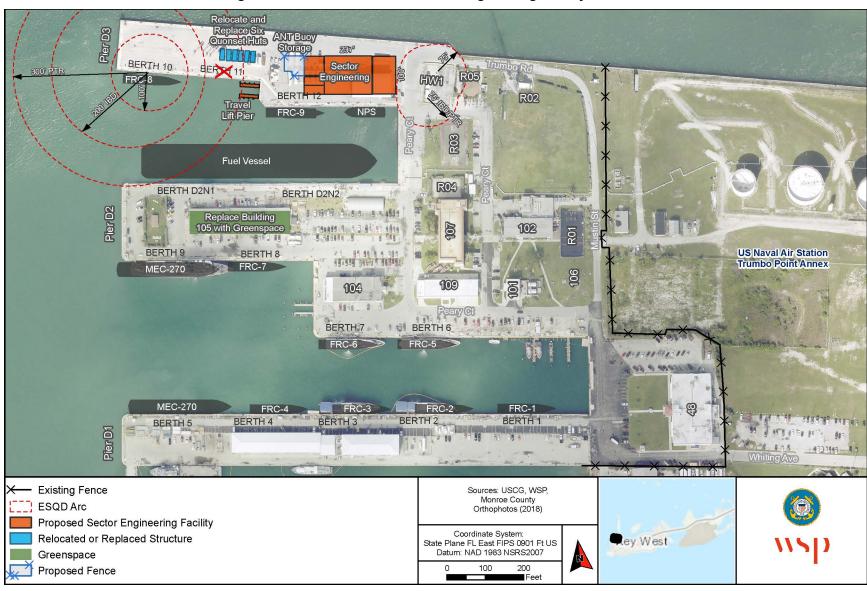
Alternative 2—Sector Engineering Facility Site Plan
